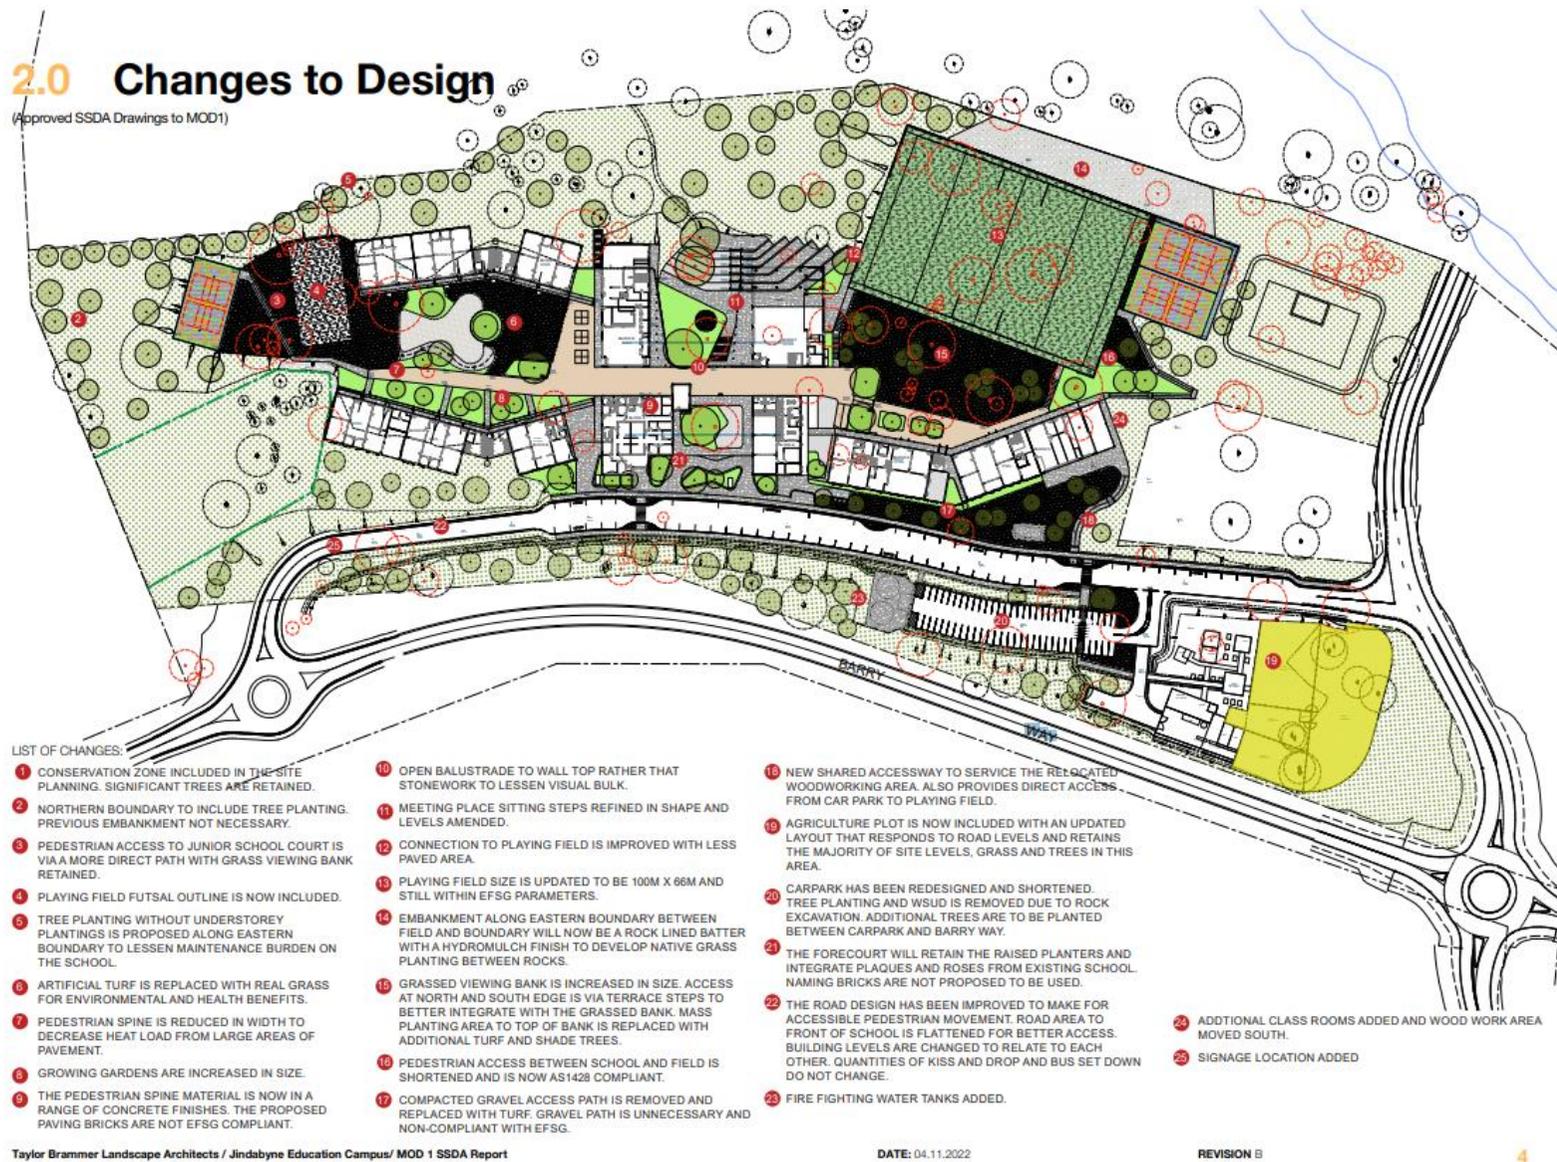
MOD 1 Landscape Plan (Taylor Brammer Landscape Architects 2022)
